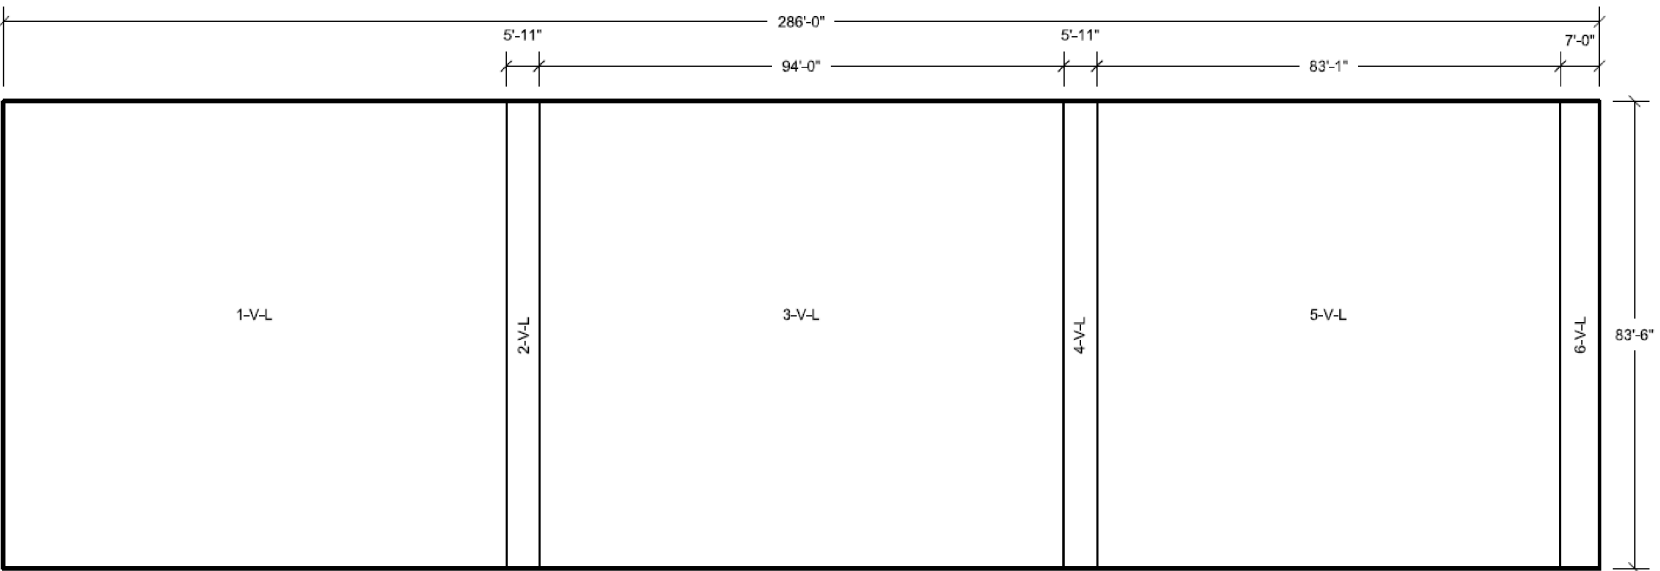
H.6-88 UHS Basin South Wall Looking North Vertical Reinforcement Zones Near Side Face
